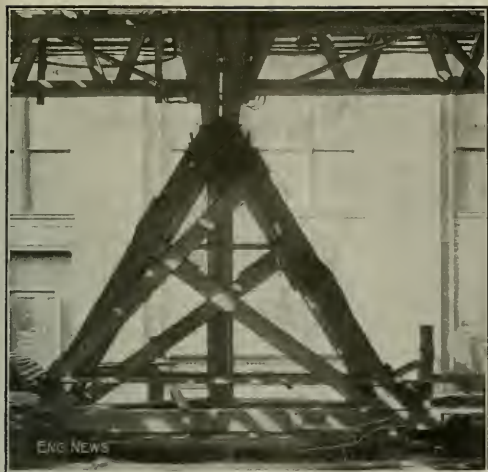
TIMBER A-FRAME WITH EYE-BAR CLAMP SUPPORTING ELEVATED-RAILWAY COLUMNS, CHURCH ST.
